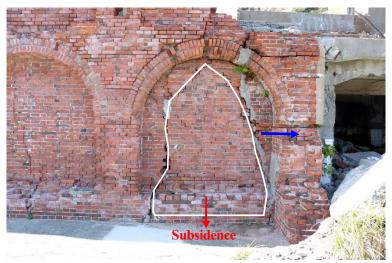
Damage to Arch No. 4 of brick walls
